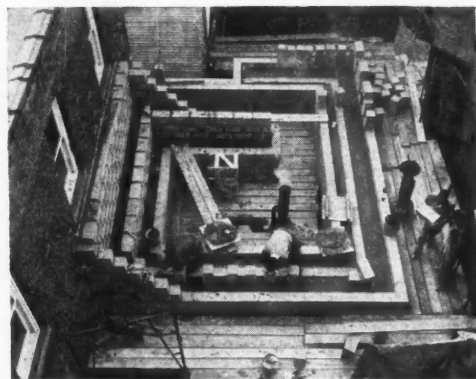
Shielding wall under construction. The wall is four feet thick, composed of alternating rows of 8 \times 8 \times 16-in. solids blocks and poured concrete, as shown.
